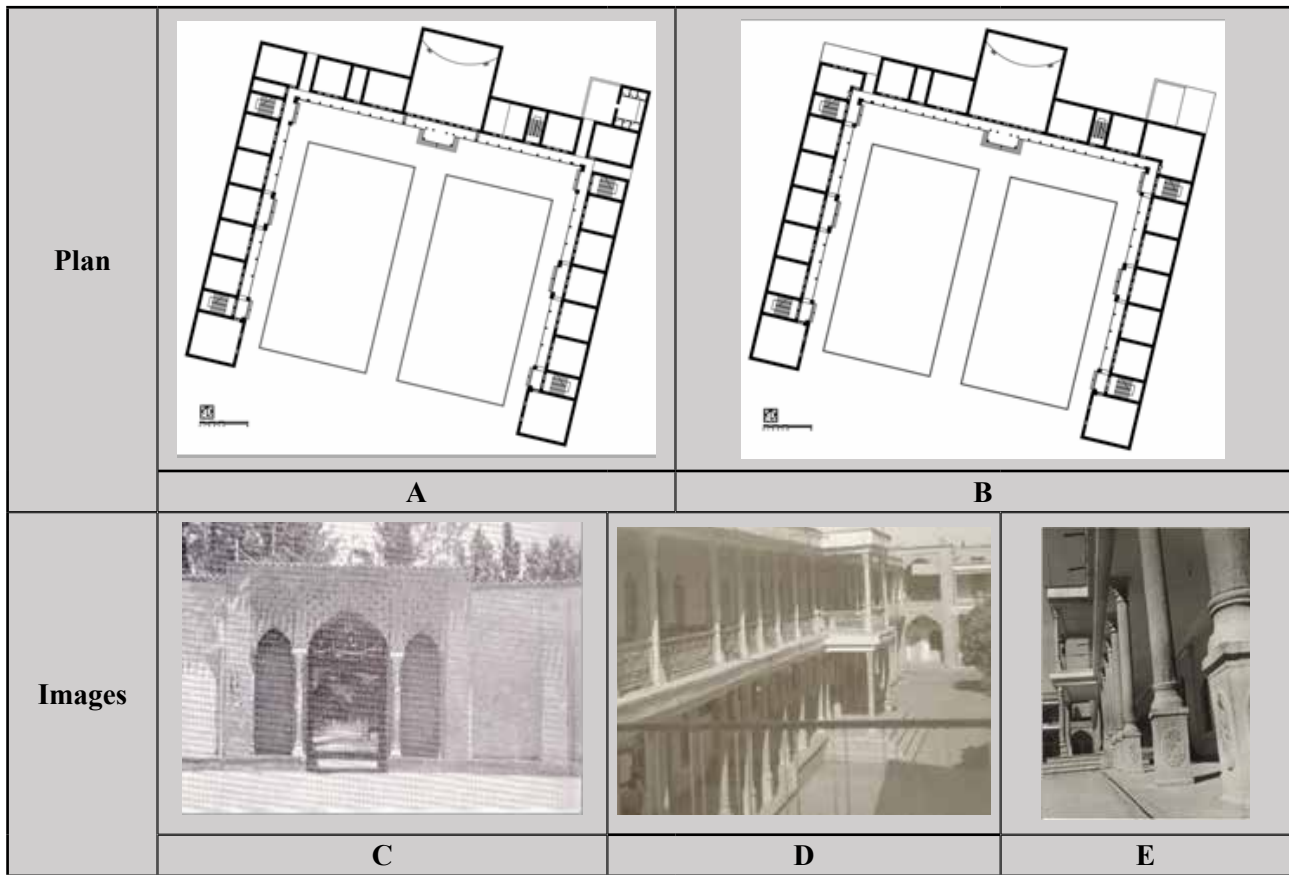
Adab High School: A- Ground floor plan; B- First floor plan (Mapping: Authors based on documentations); C- High school entrance; D- South view of the school; E- Columned Iwan. Source: Archive of Isfahan Museum of Education.
